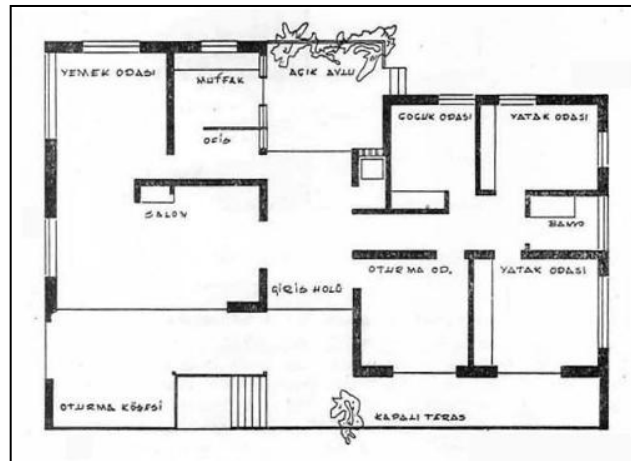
Floor plan of a villa in Çiftelavuzlar [85]
